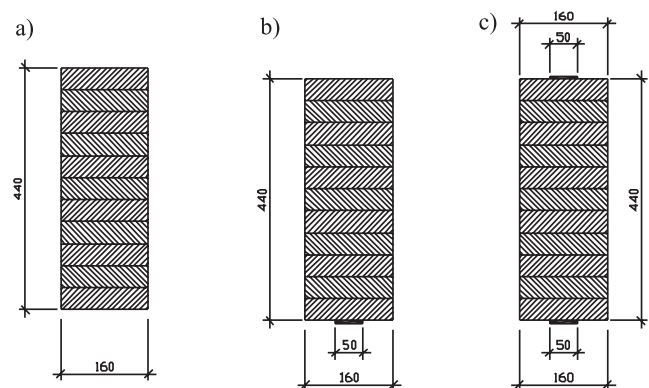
Configurations of reinforced timber beams for testing: a) Not reinforced gluelam beam; b) One-sided reinforcement of a gluelam beam; c) Both-sided reinforcement of a gluelam beam
